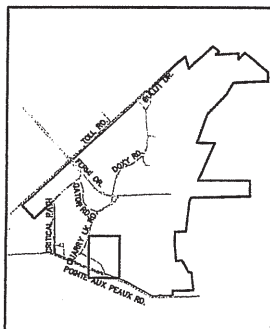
A CONSTRUCTION AREA 1 PLAN VIEW A
